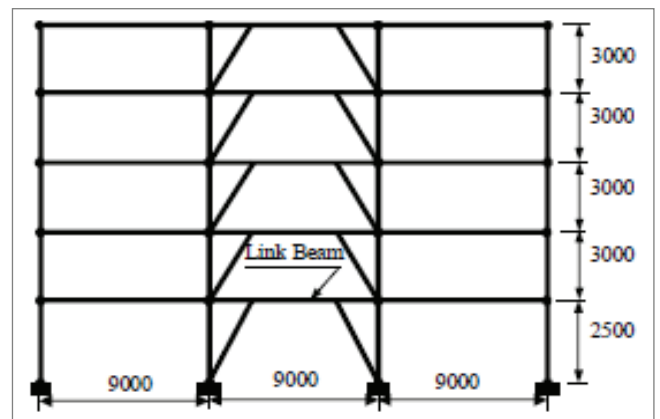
Long Span Steel-Concrete Composite EBF Frame
